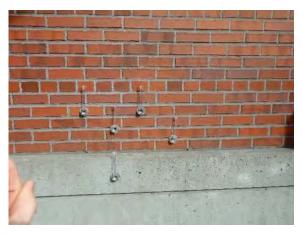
Depicts overview of RILEM testing at the South Elevation adjacent the parking lot. This area exhibited strong resistance to moisture penetration at all the tested masonry and concrete surfaces.
